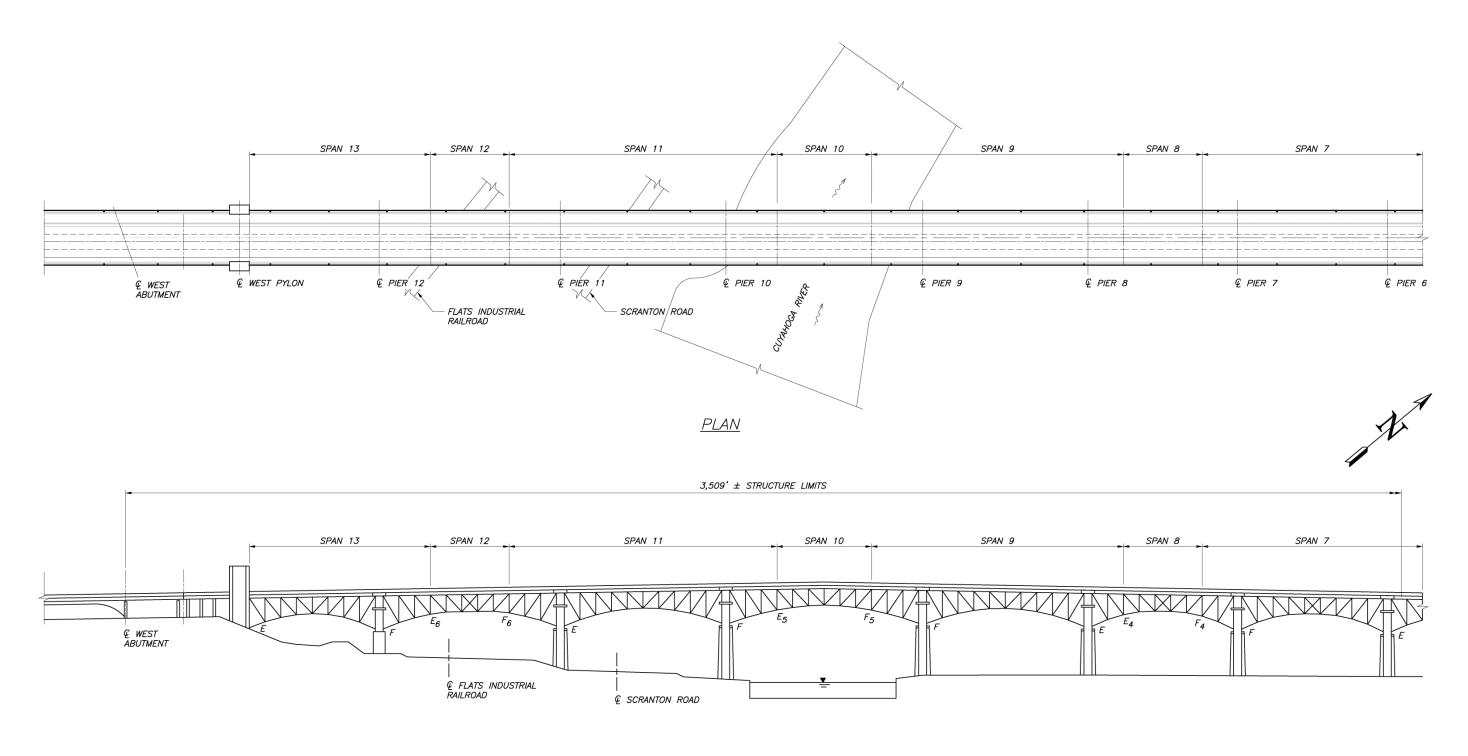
South Elevation, Lorain-Carnegie Bridge.
